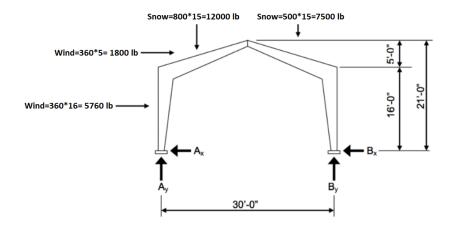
Elevation view of pre-fabricated steel building frame subject to snow and wind loadings.
